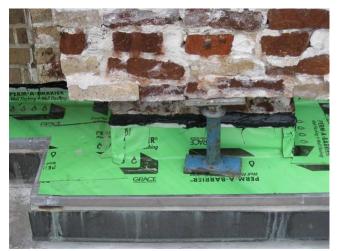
Good roof interface flashing is properly terminated in the cavity and extends out beyond the face of the veneer.
